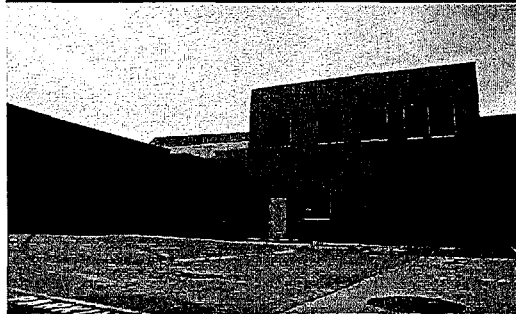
SFO GTU GARAGE (LOOKING NORTHEAST)
